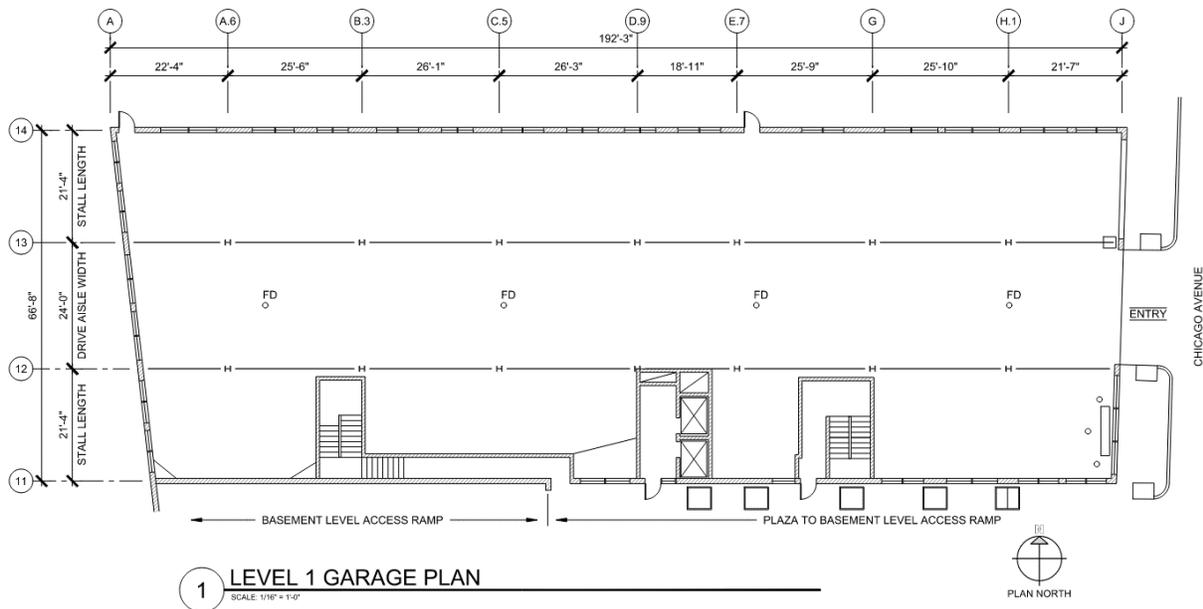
Plan view of the ground floor of the Chicago Avenue Parking Garage
